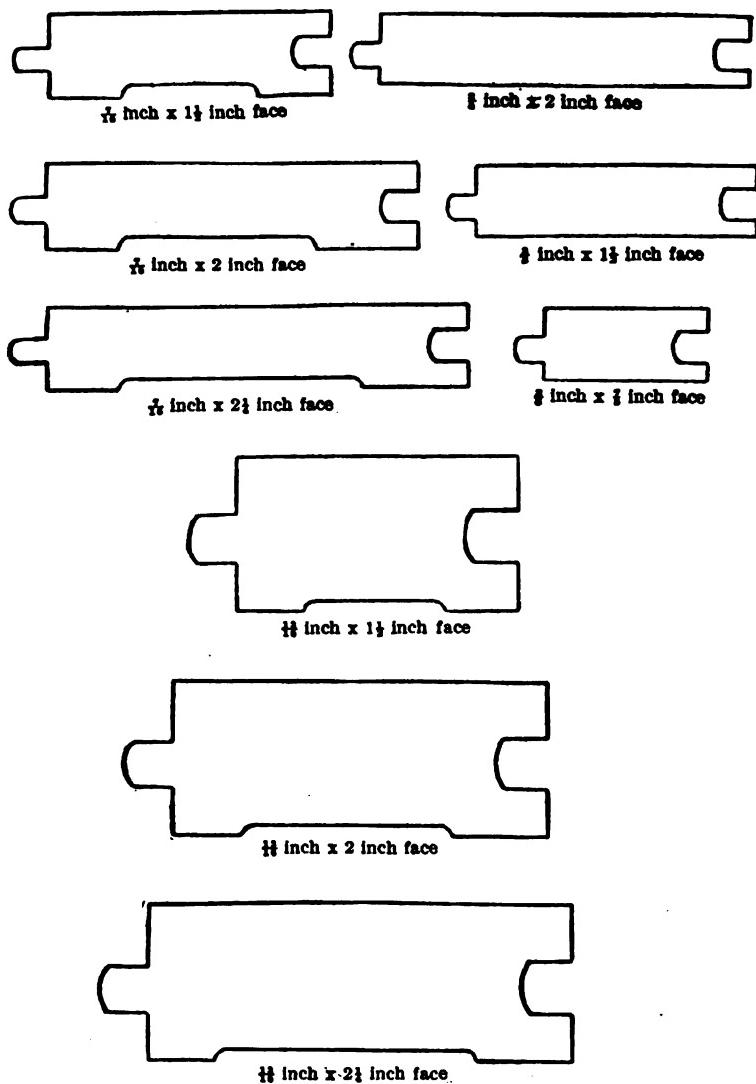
Full-Size Sections of Hardwood Flooring Boards.
